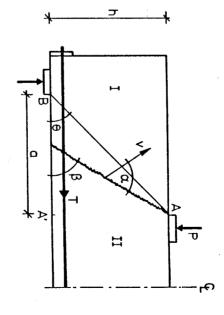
Failure mechanism in shear span for beams without web reinforcement.
